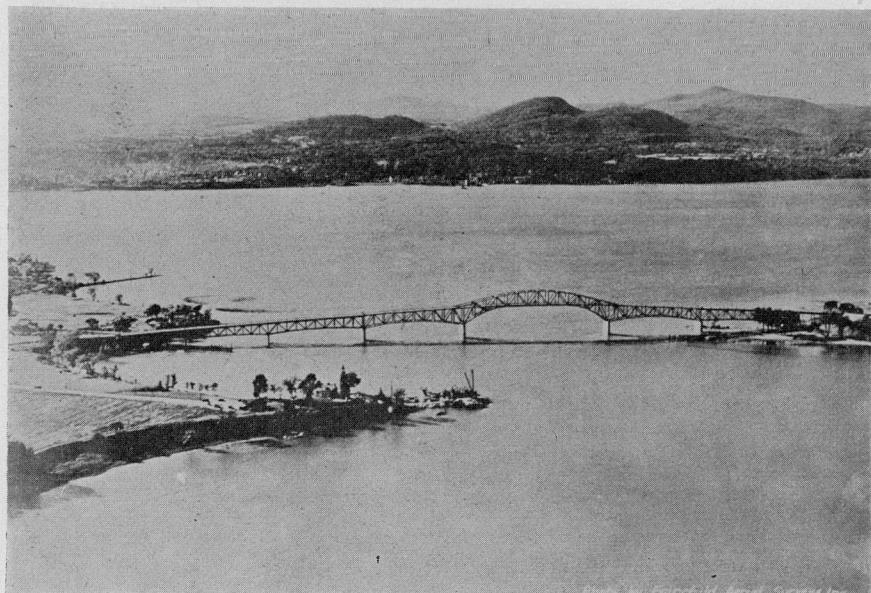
LAKE CHAMPLAIN BRIDGE AT CROWN POINT, NEW YORK
